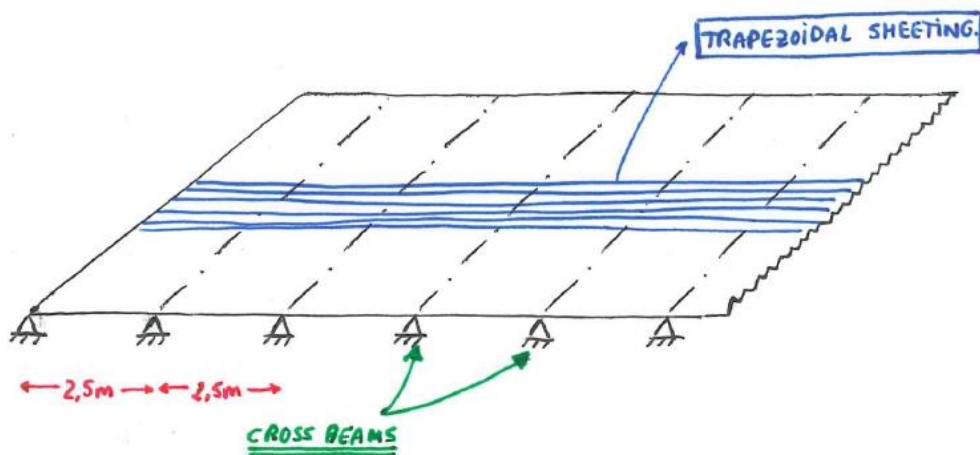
Layout of the trapezoidal sheeting in front of the cross beams.
